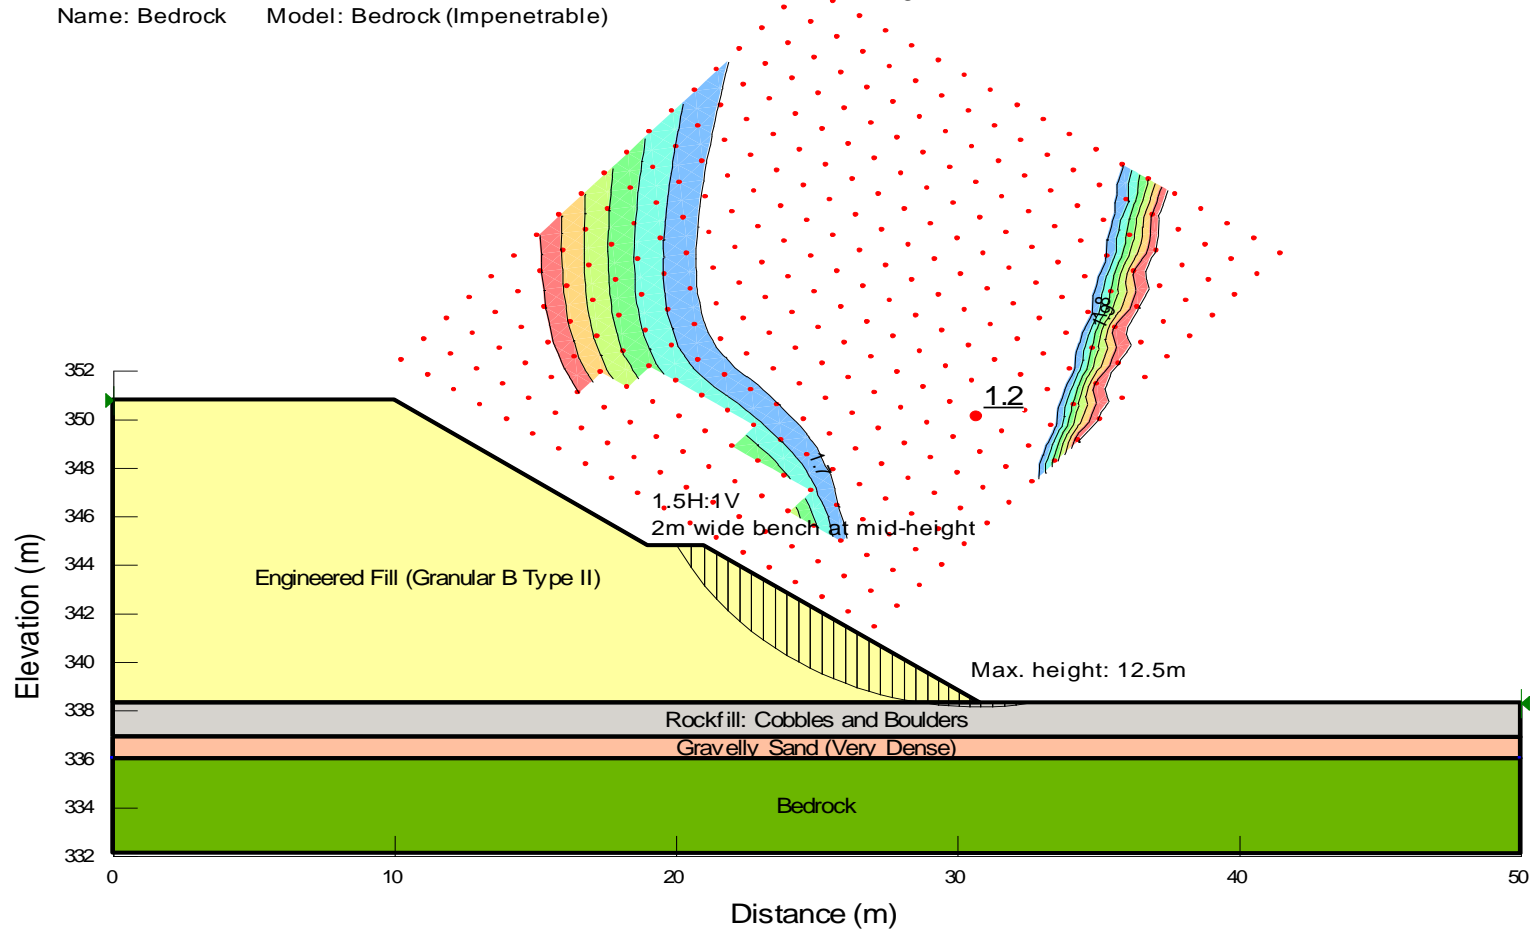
Slope stability analysis for new embankment constructed by cut and cover replacement method - drained seismic condition
